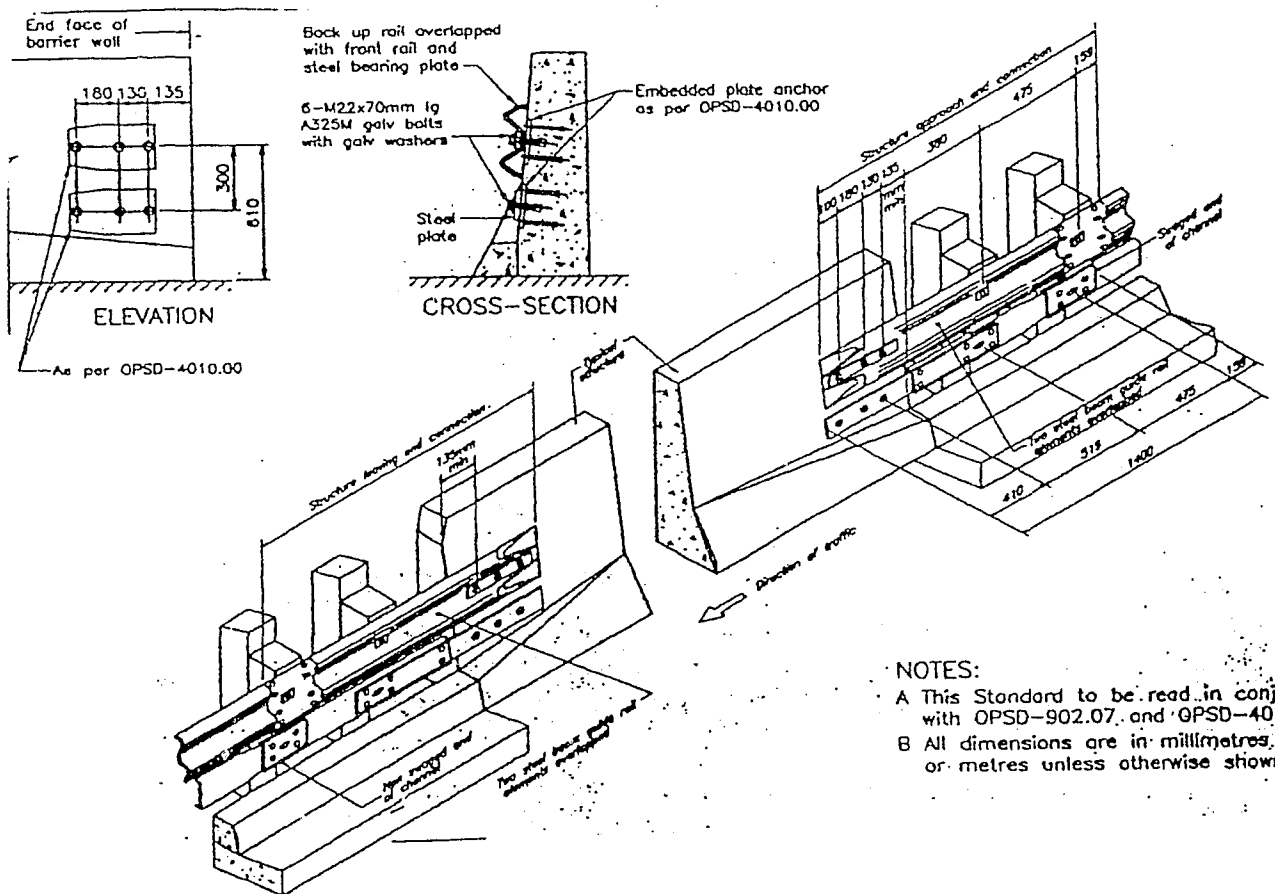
Detail of Barrier Wall and Deck Edge [Ontario Provincial Standard Drawings]
